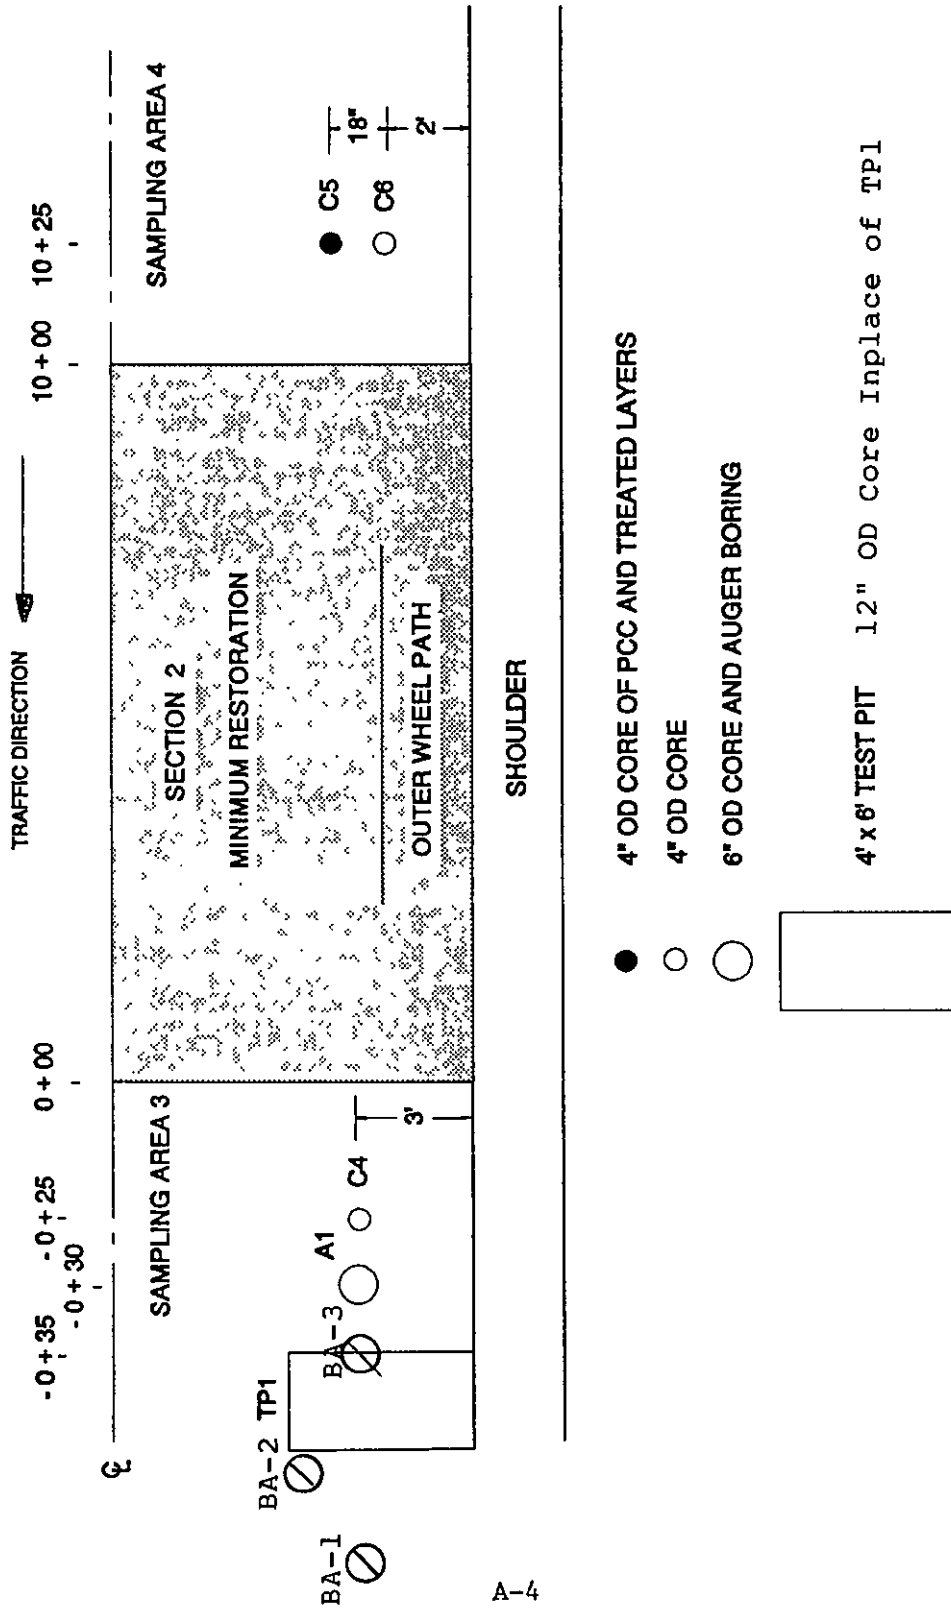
Example of "Pre-Construction" Sampling Plan for Test Section 2
